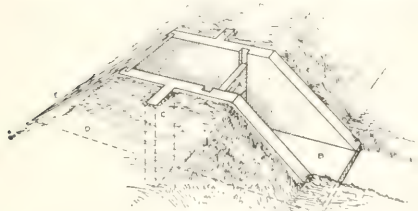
Outlet for pond. A, flashboards; B, apron; C, core; D, embankment; E, screen
